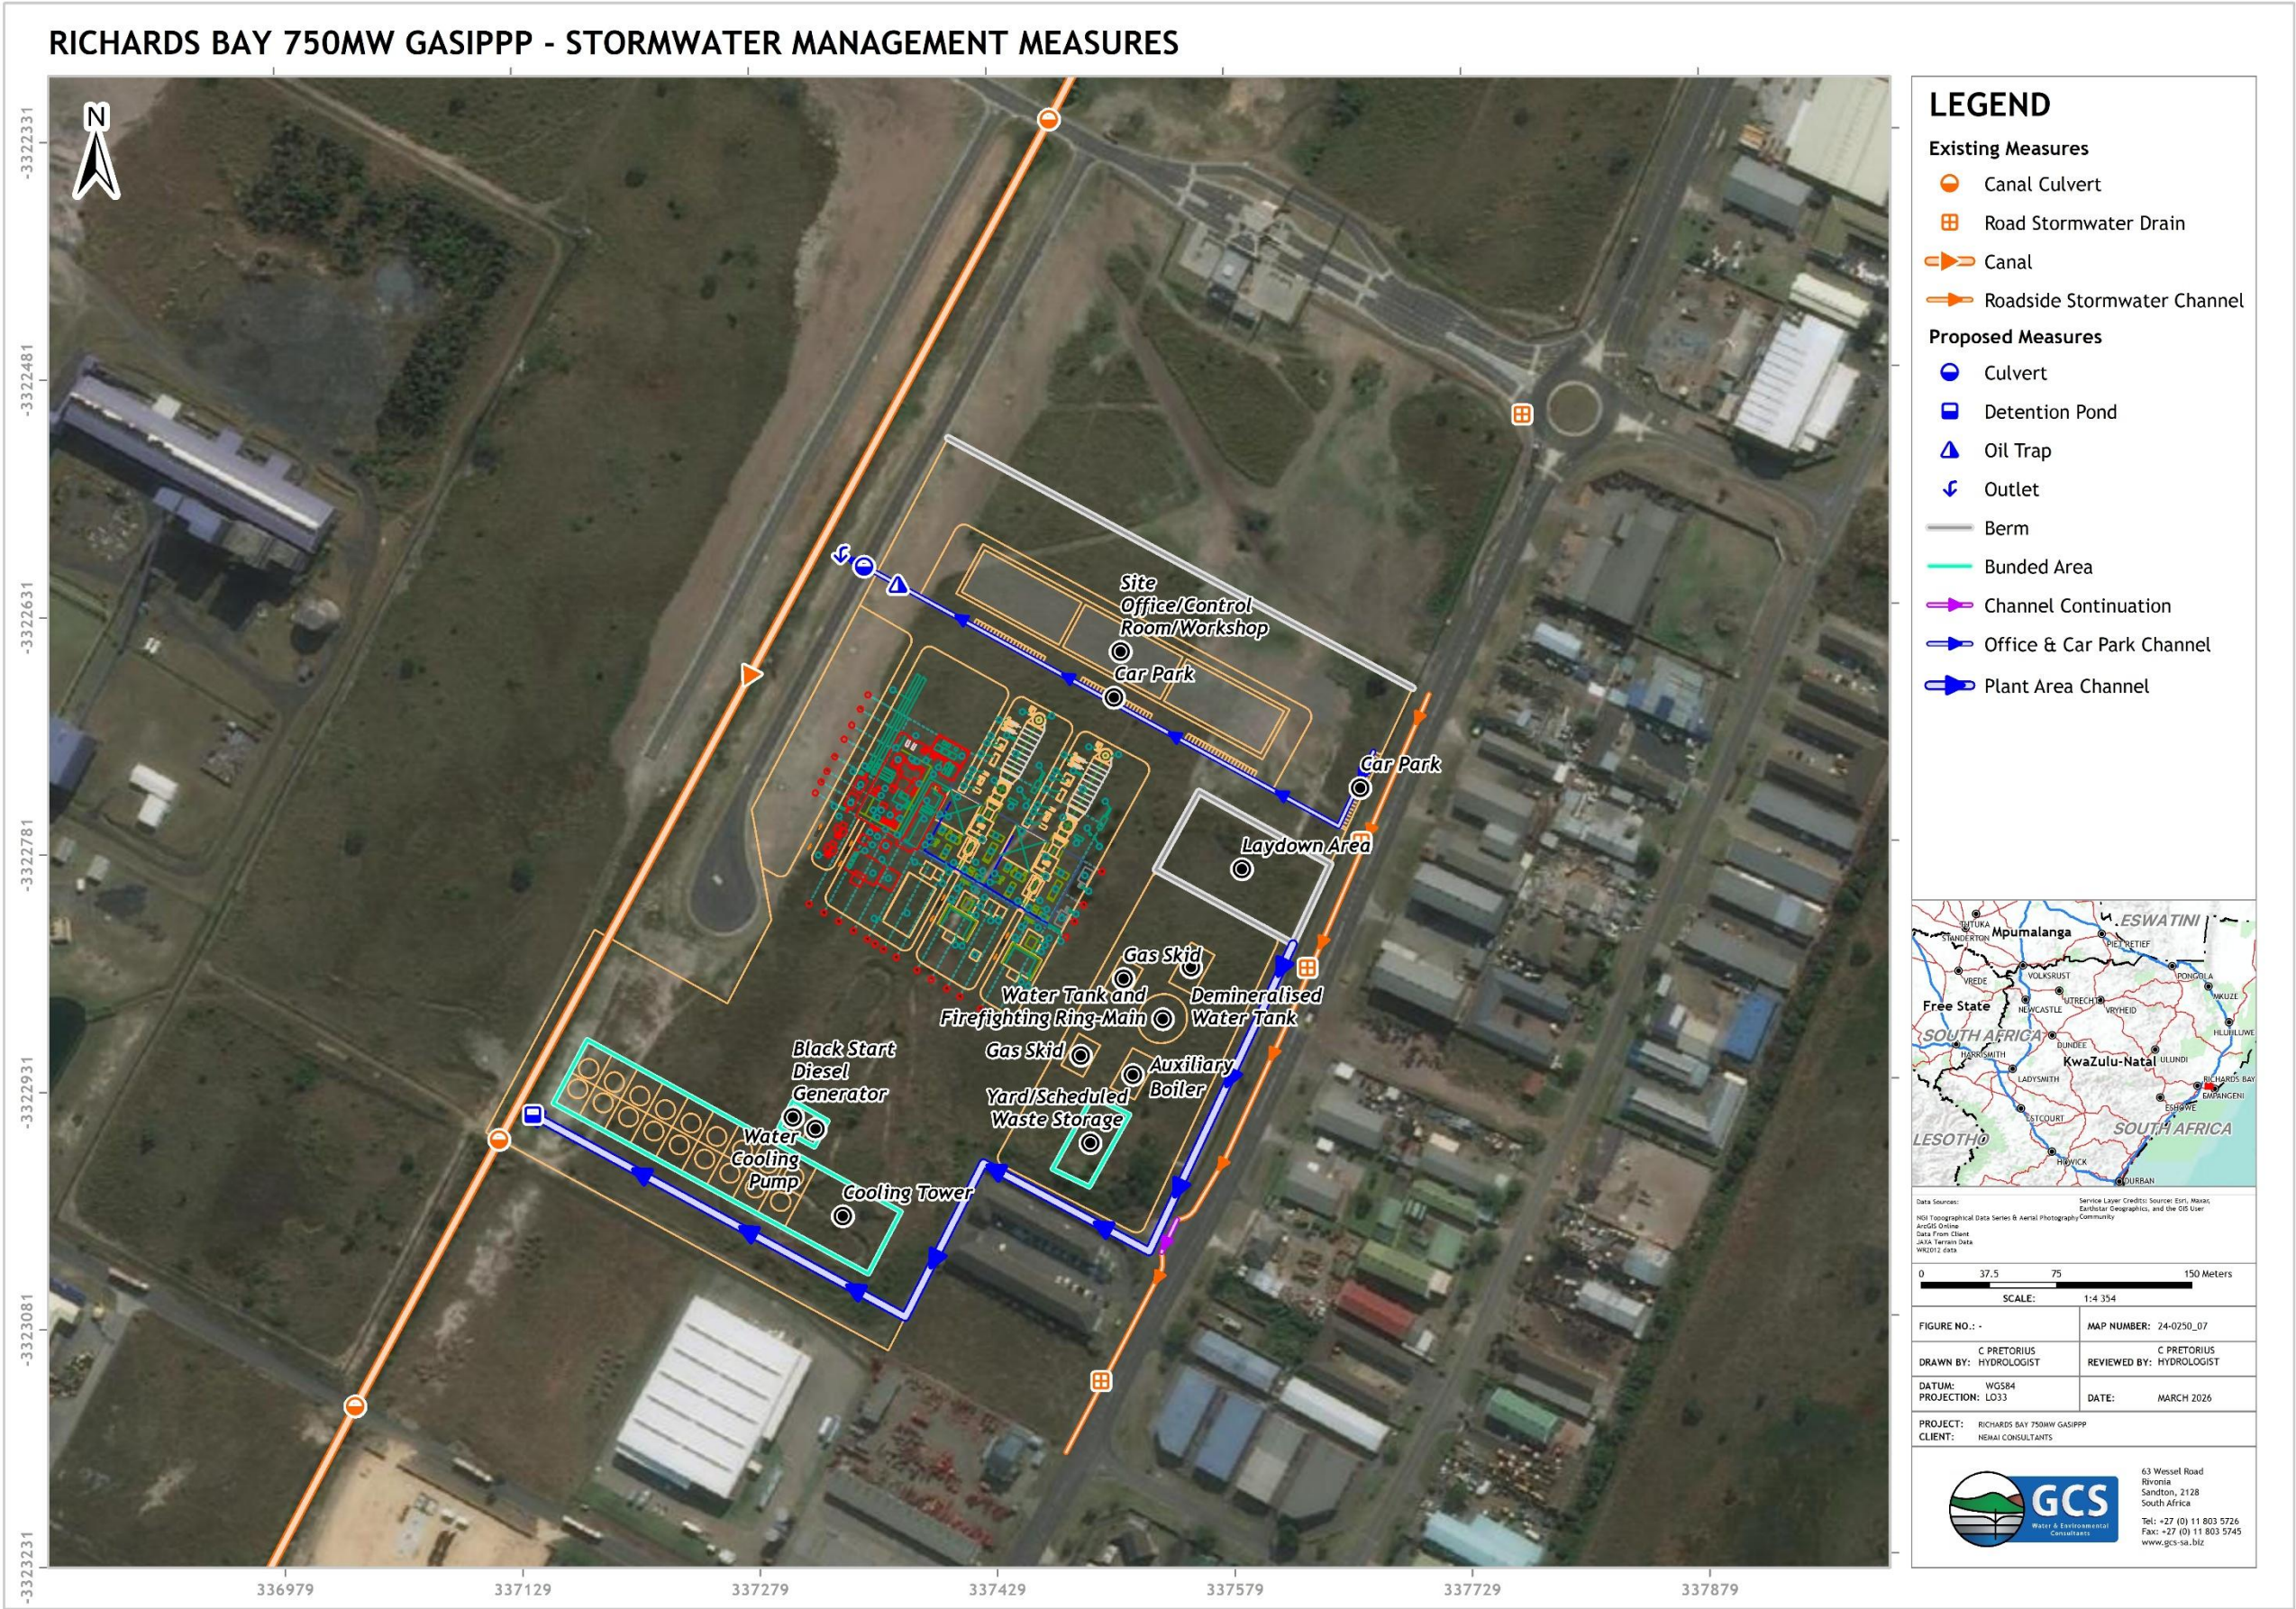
Existing and proposed stormwater management recommendations for the CCGT Power Plant
